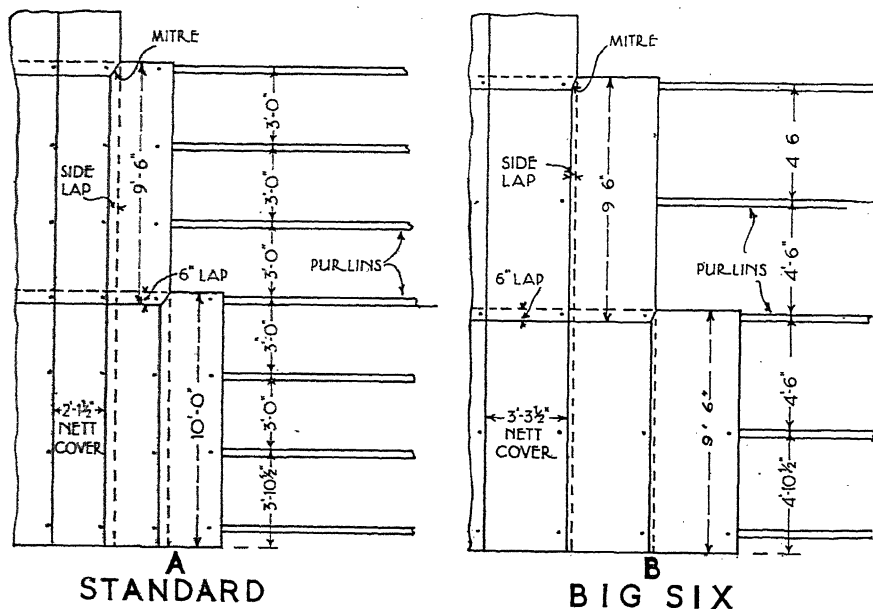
THE PURLIN SPACING FOR STANDARD CORRUGATED ASBESTOS SHEETS
